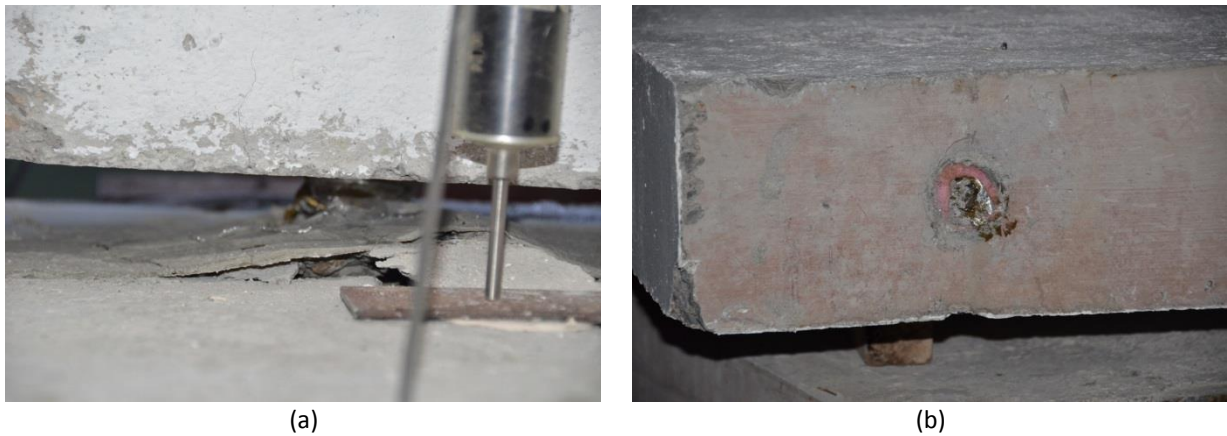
Test A1D25M-G: Damage observed on the tension side at the end of the initial monotonic loading: (a) severe damage to the beam around the rebar; (b) broken rebar but no visible damage to the panel.
